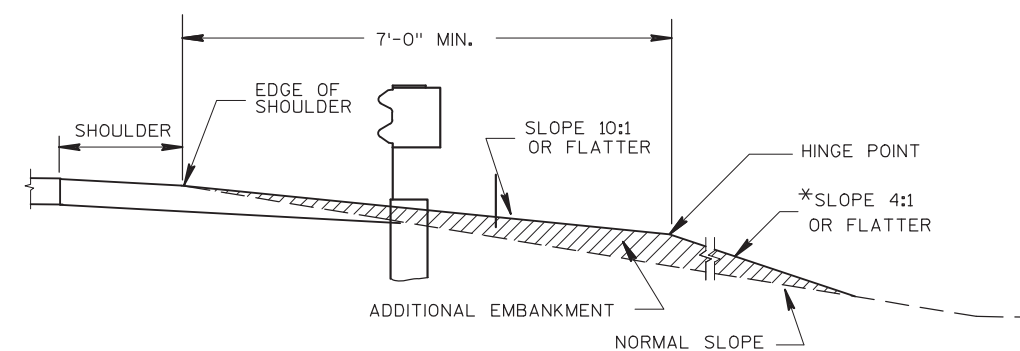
DETAIL FOR ASPHALTIC SHOULDER TAPERS AT BEAM GUARD
